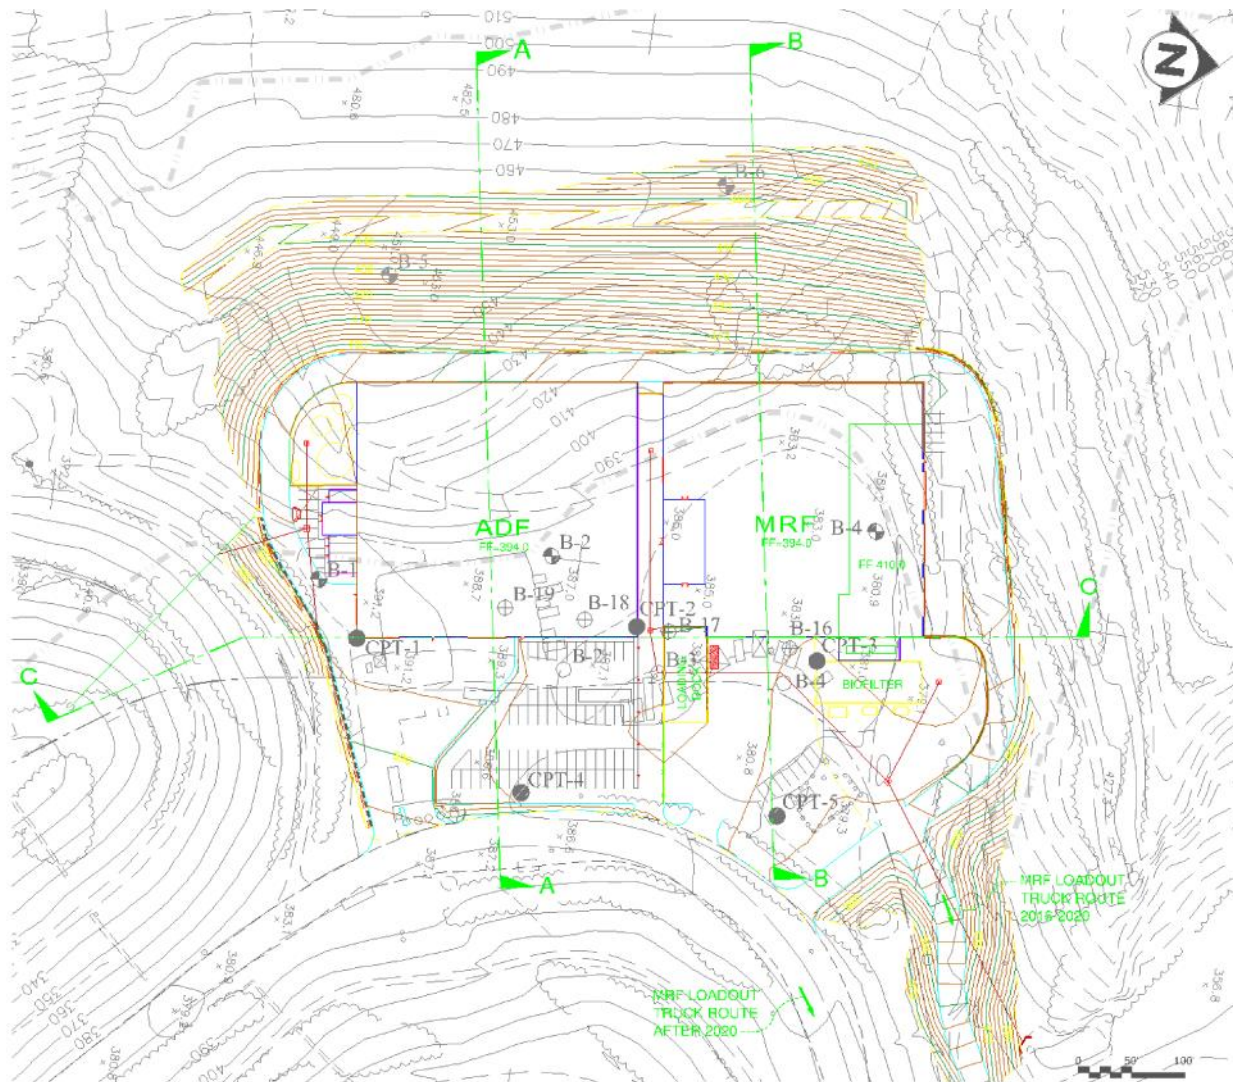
Location of Cross Section Profiles through the Operations Deck.
